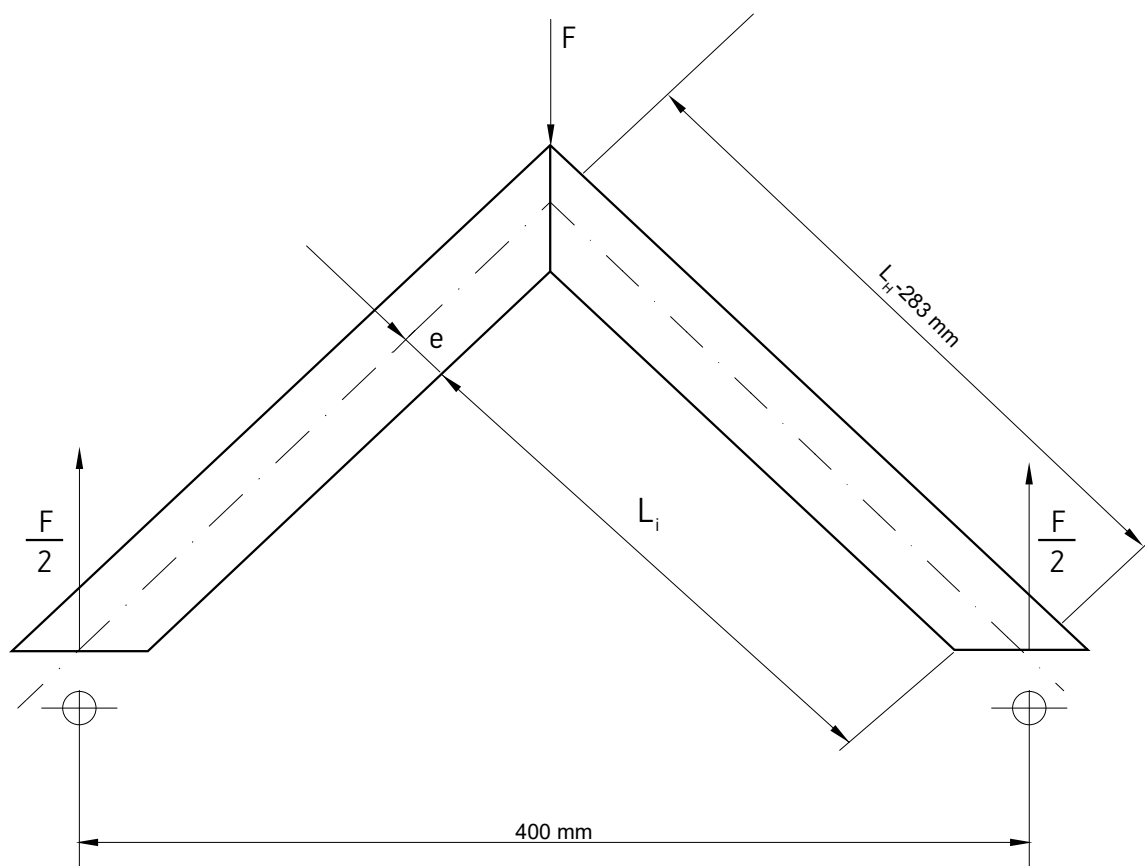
Sketch of the sample to test angle weld connection
